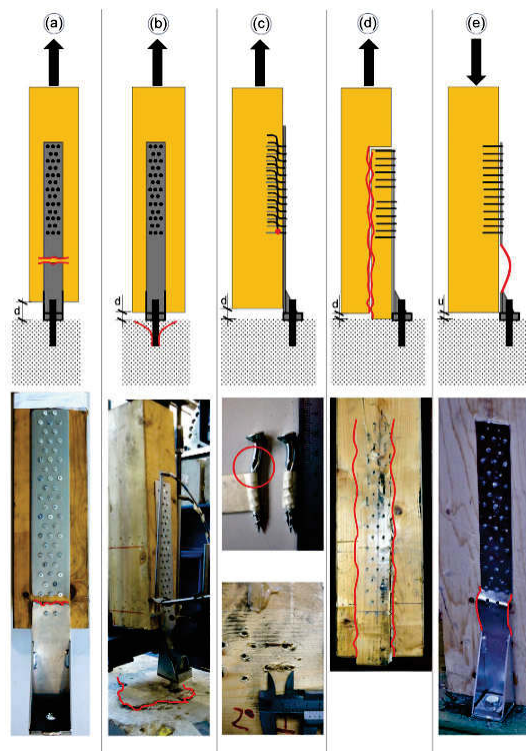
Typical failure modes for hold-down connection: (a) steel break-out in tension, (b) anchorage’s failure, (c) plastic hinge of screws combined to embedment of timber plug-shear, (e) buckling of steel flange. (from [20])
